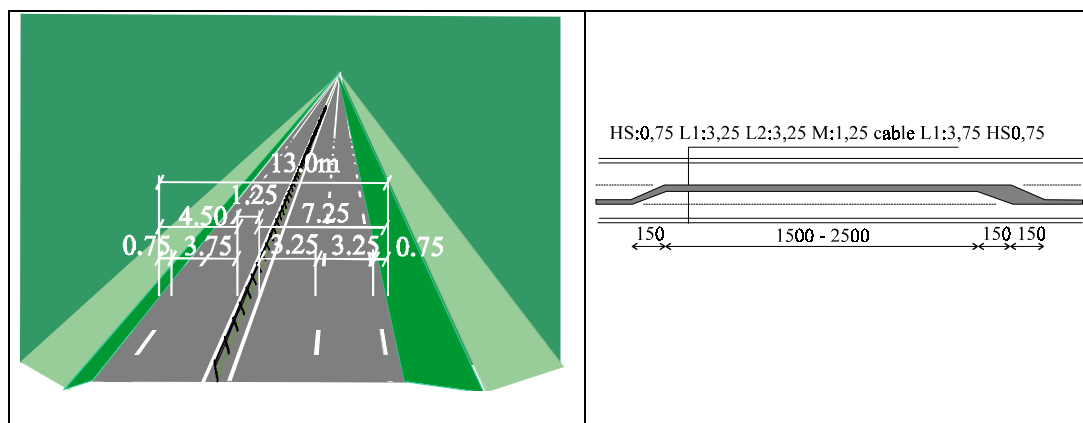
Proposed standard 2+1-cable barrier cross-section within existing 13 m.
